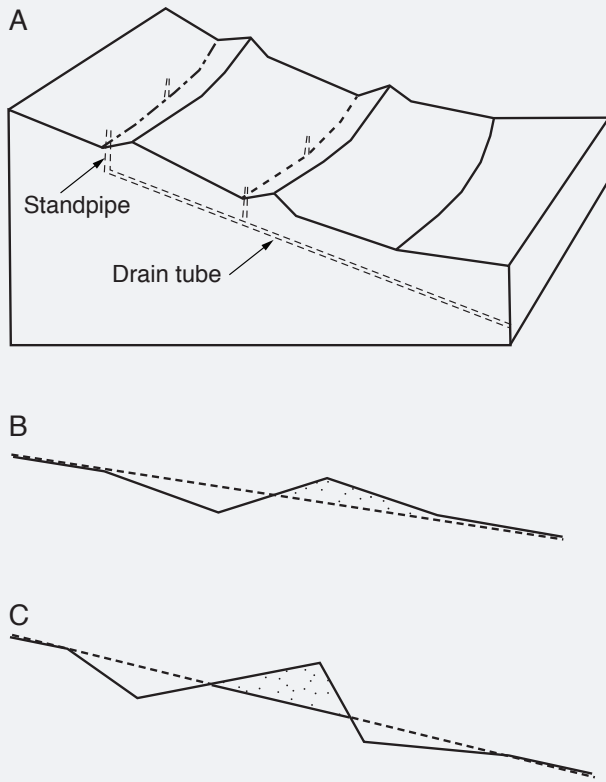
Sketch of a parallel tile outlet terrace (PTO). (B) Most terraces are wide enough so crops can be planted on them.
